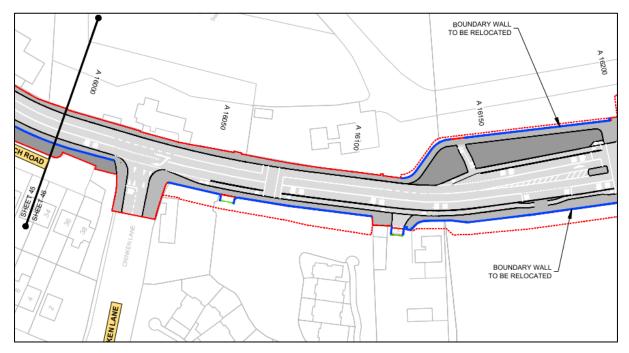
Extract from Boundary Treatment Drawing at Crinken Lodge (Sheet 46)
